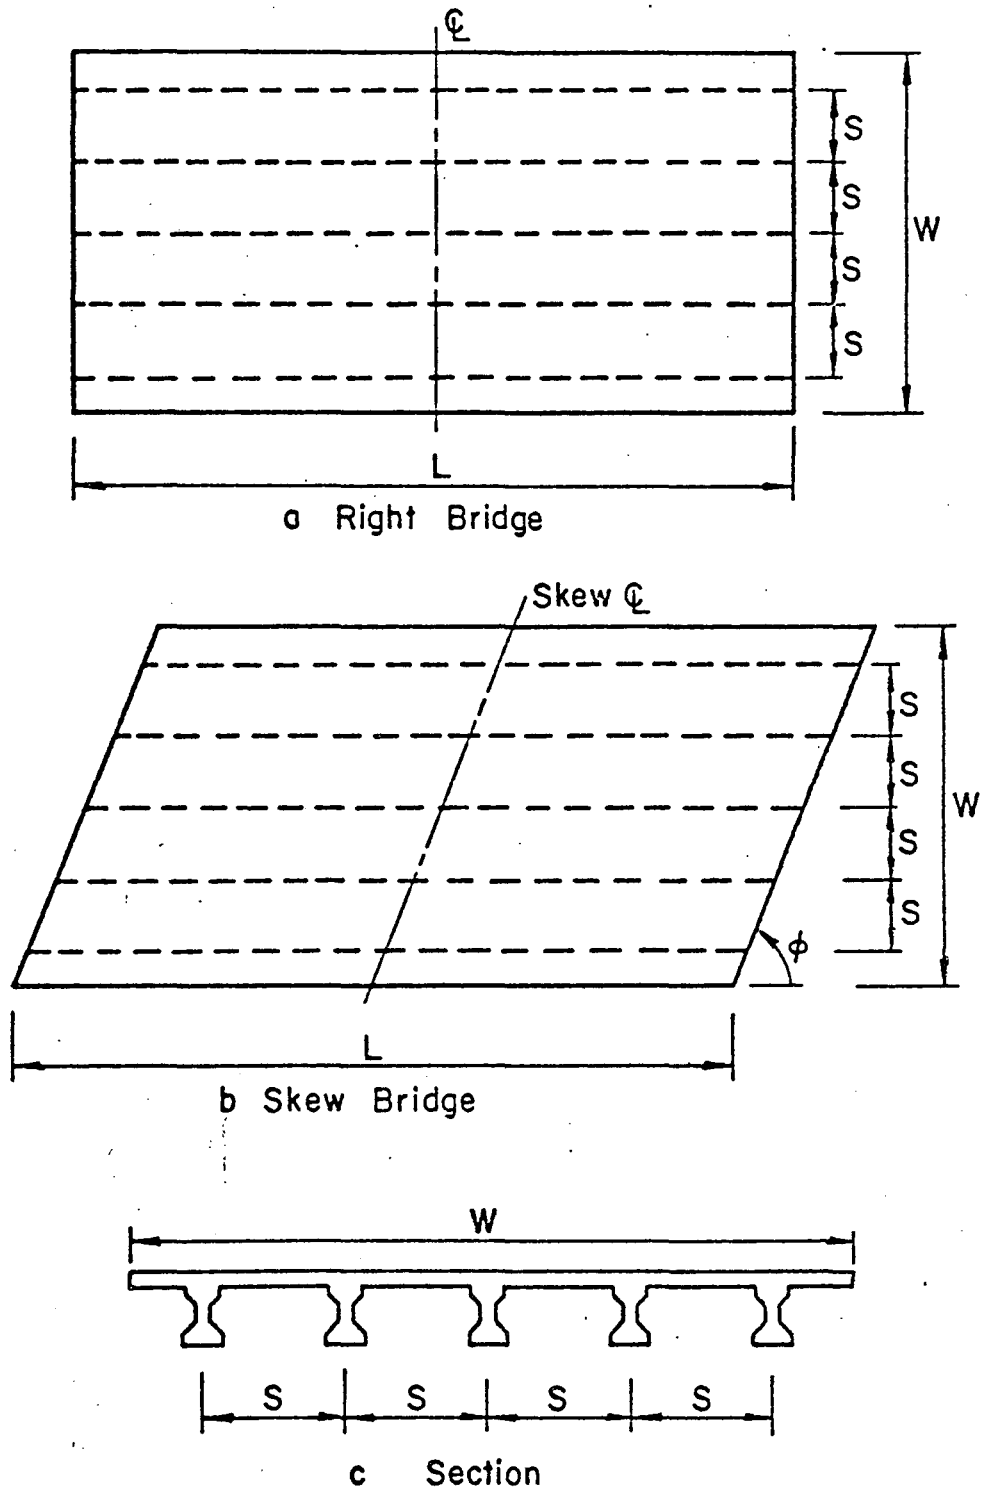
Plan and Cross Section of a Beam-Slab Bridge
